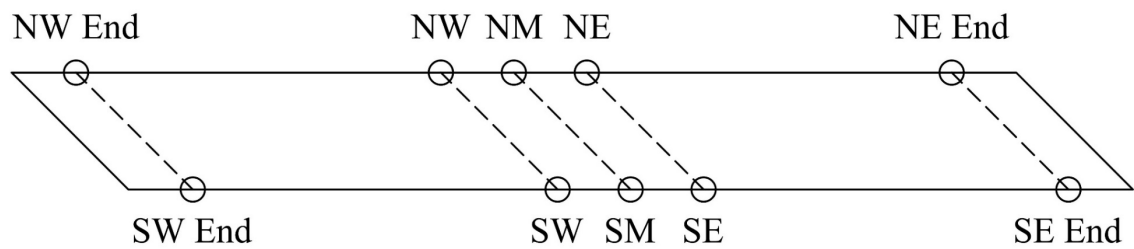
Instrumented potentiometer sections for Rehoboth Bridge beams
